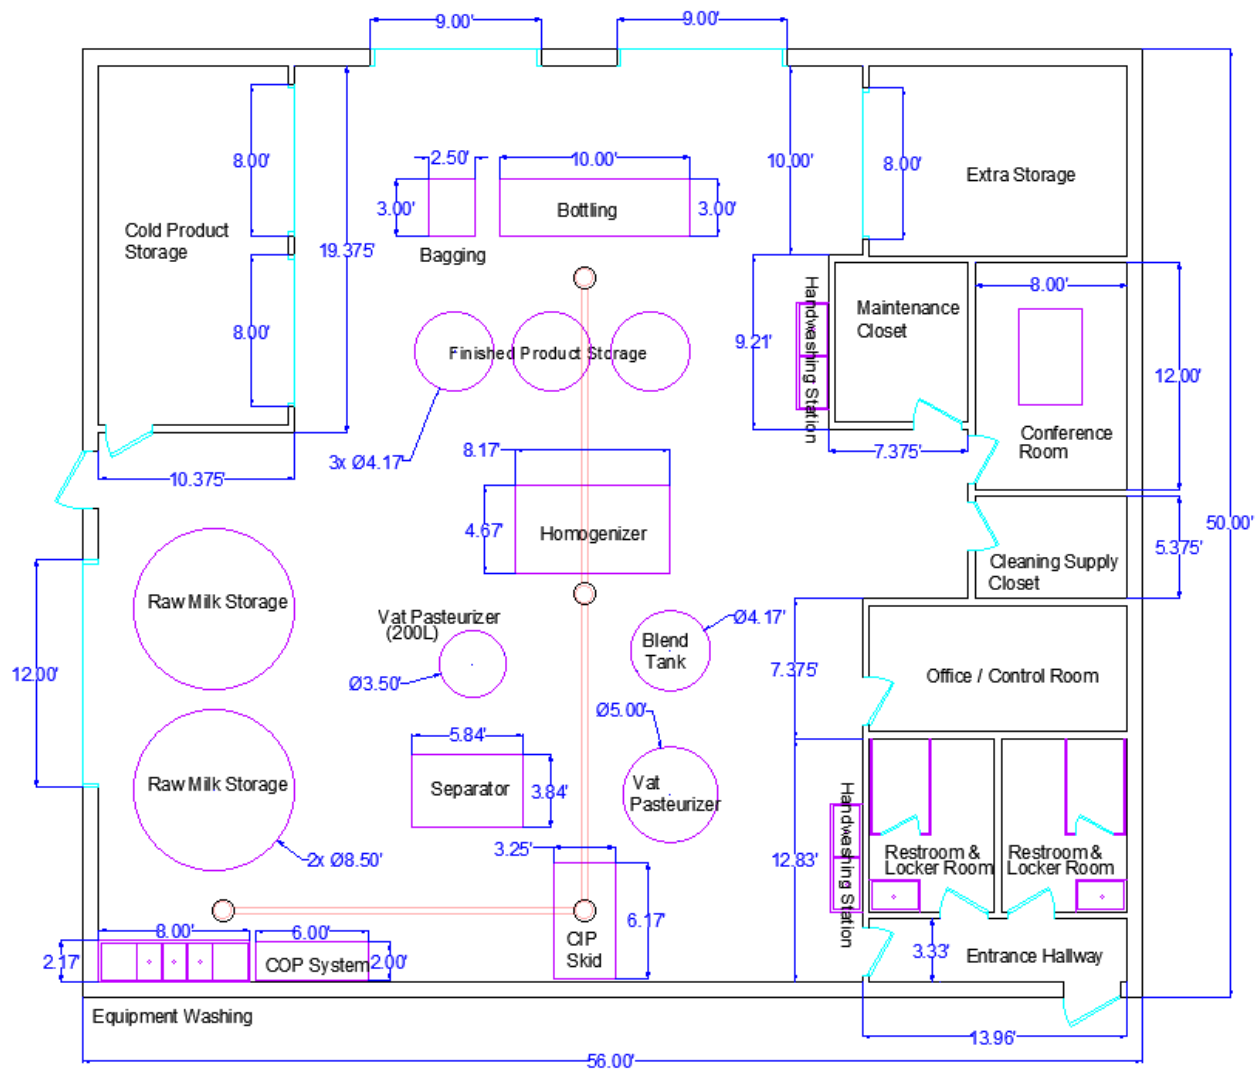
Dimensioned View of the Dairy Processing Plant Floor Layout
